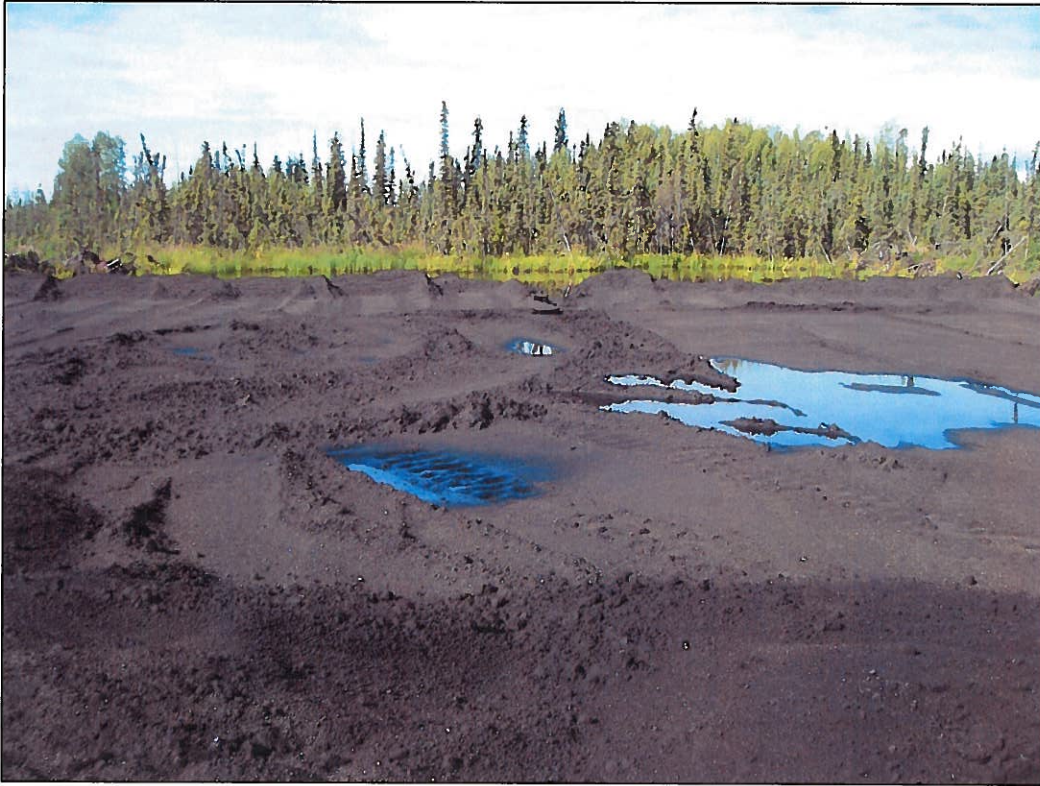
West end of Wayne's Way with pond visible beyond coal ash (USACE, August 6, 2014).
